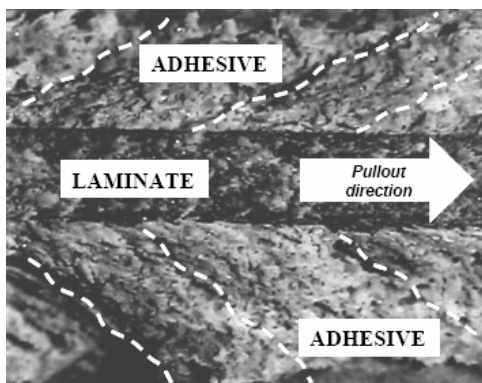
Crack pattern at the laminate-adhesive-concrete bonding zone
